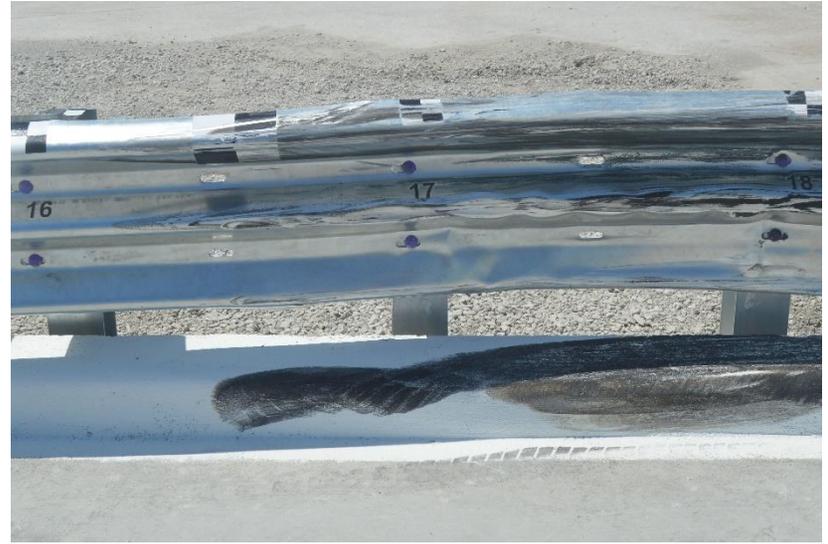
Thrie Beam Damage, Test No. HWTT-2
